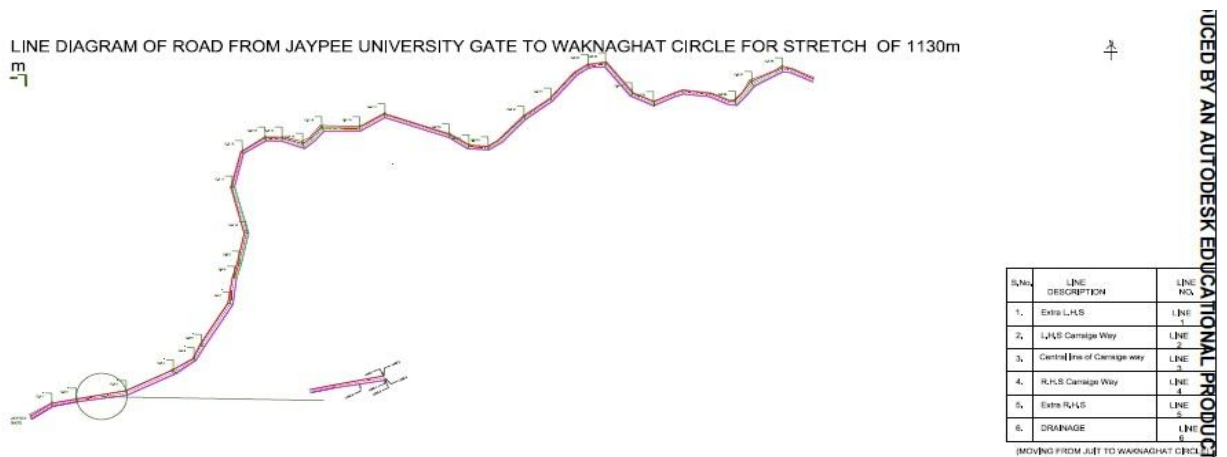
(a) Auto cad drawing for road stretch from Jaypee Gate to 1130m
